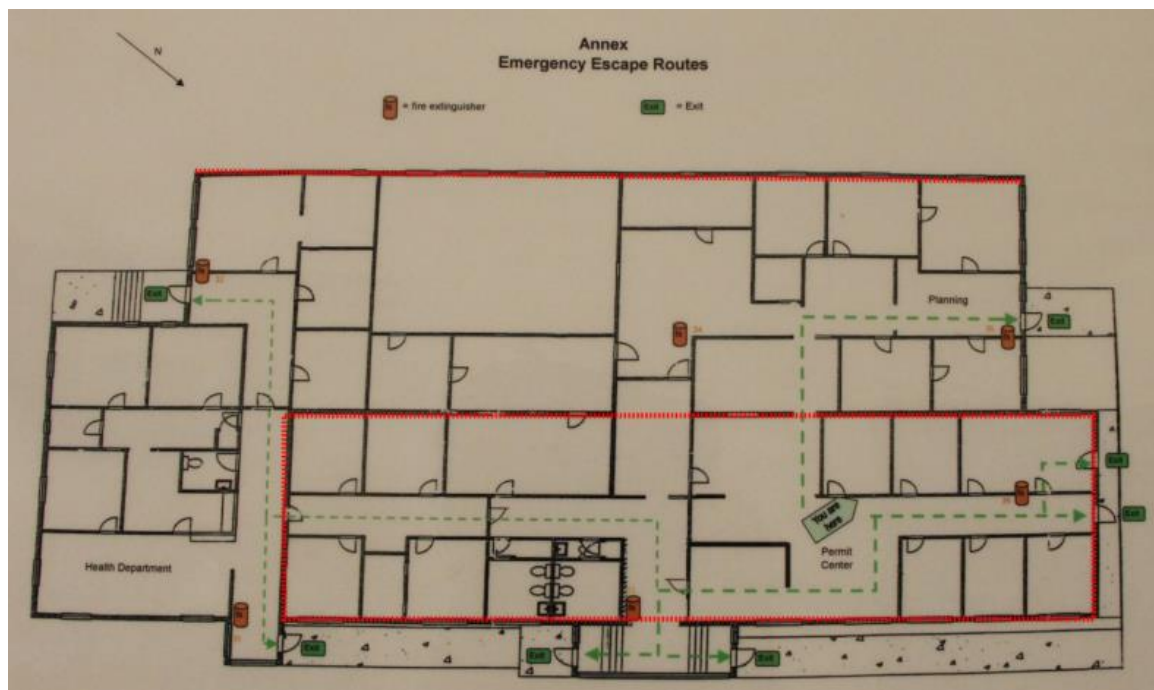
Courthouse Annex First Floor Plan. The red lines are annotated by WJE and indicate the location of CMU walls.
